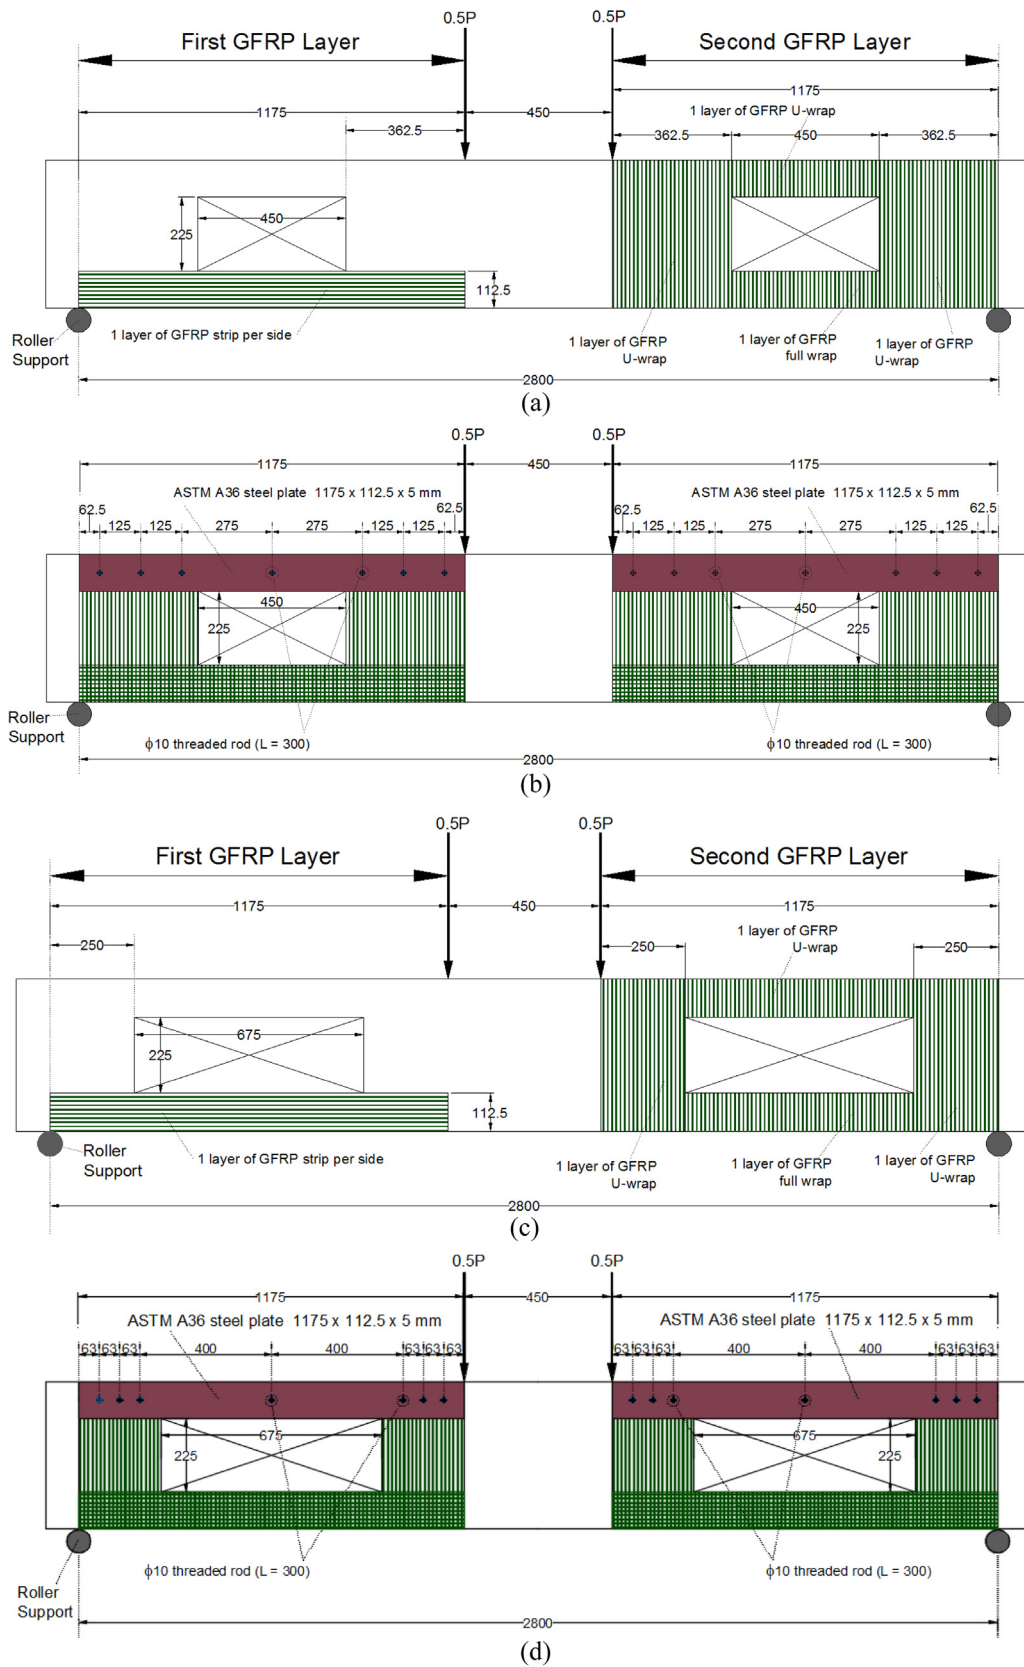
Details of beams strengthened with scheme-2 (Note: All dimensions are in mm): (a) GFRP layers of specimen BS2-01; (b) Steel plates of specimen BS2-01; (c) GFRP layers of specimen BS2-02; (d) Steel plates of specimen BS2-02.
